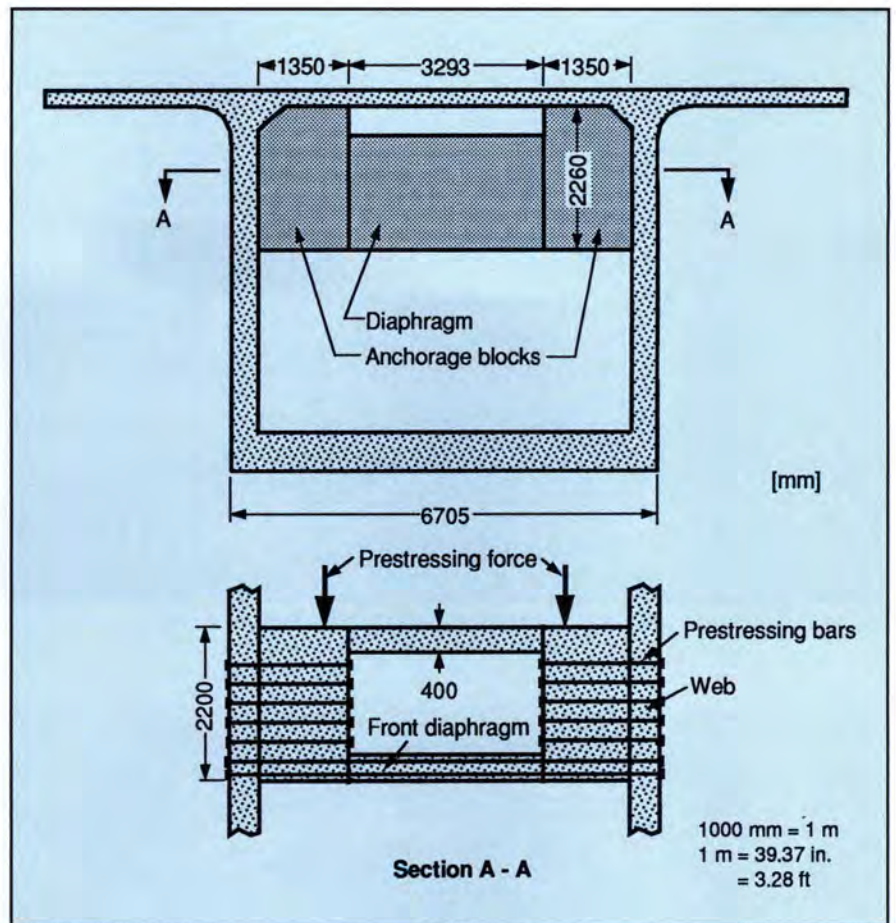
Schematic view of anchorage blocks and diaphragms.
